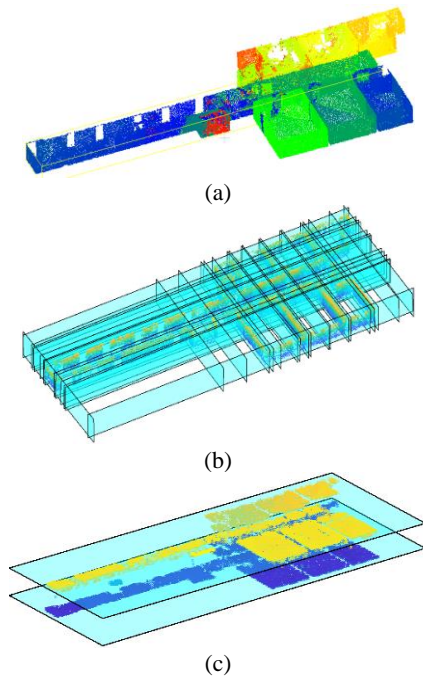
Extraction of building structures of the TUB1 building: (a) the point cloud (the ceiling is removed for a better visualization), (b) vertical structures (c) horizontal structures.
